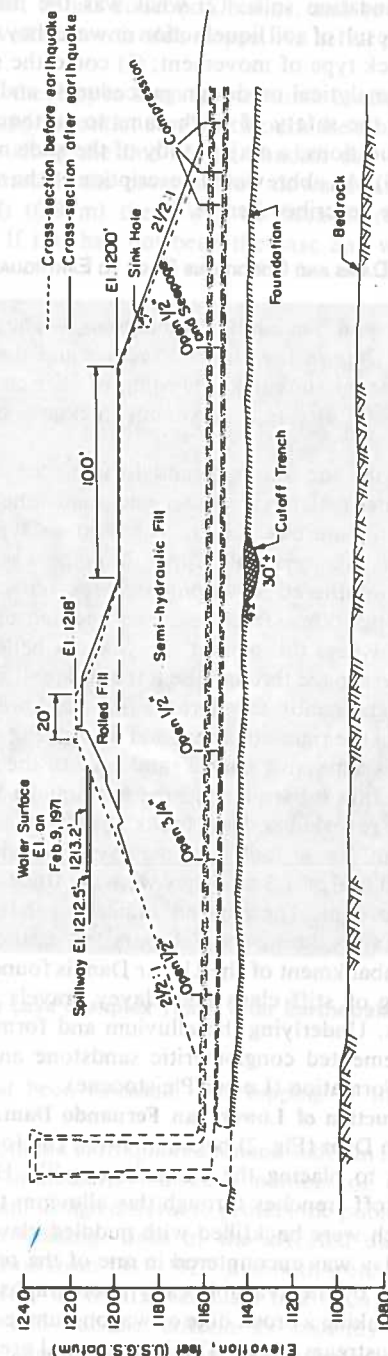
Cross Section of Upper San Fernando Dam (Los Angeles Department of Water and Power) (1 ft = 0.305 m)
